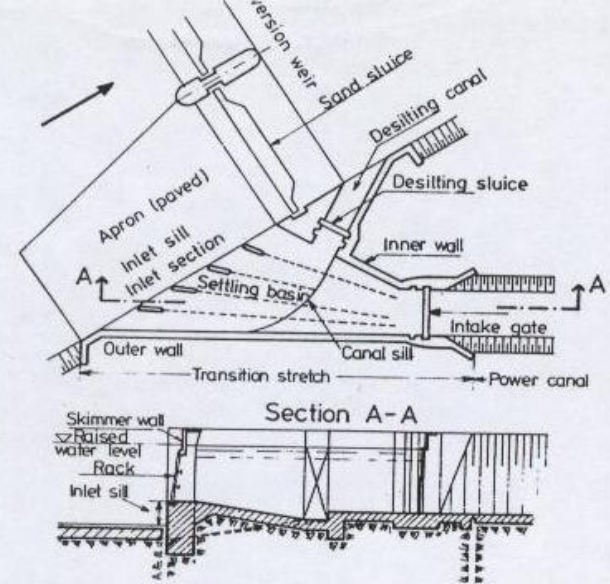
/20. Canal intake on rivers carrying heavy bed load
